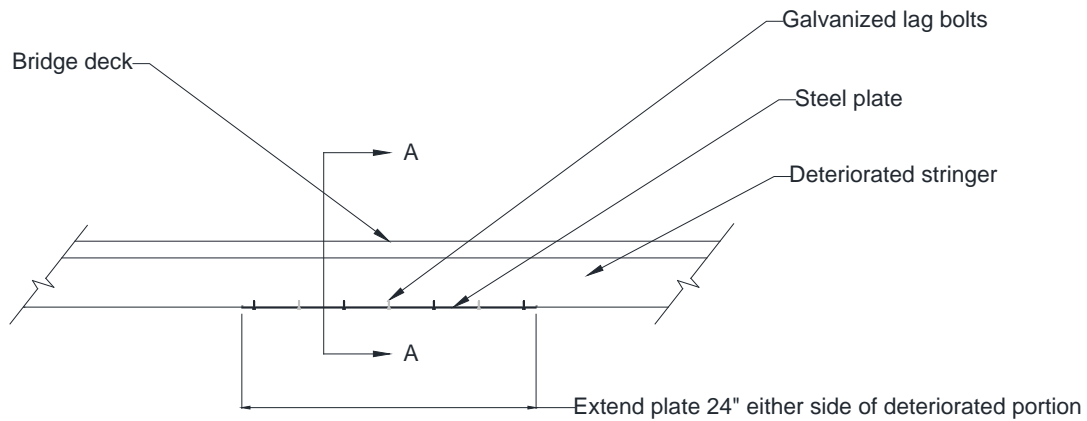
Strengthening of timber girder or stringer – flexural reinforcement, bottom plate
